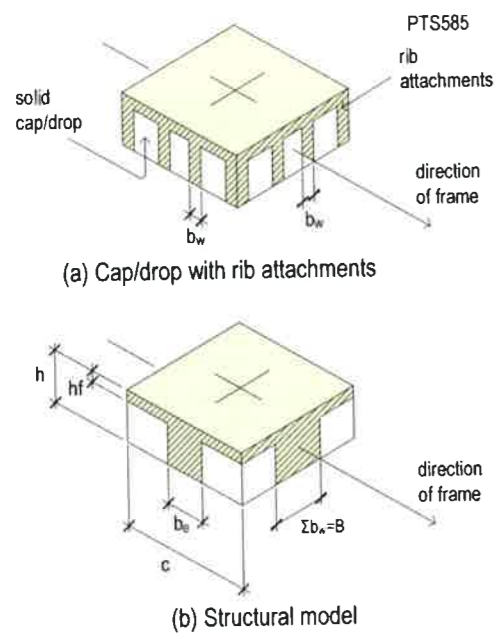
B-2 Analytical Model of the Solid Region of a Waffle Slab Floor
